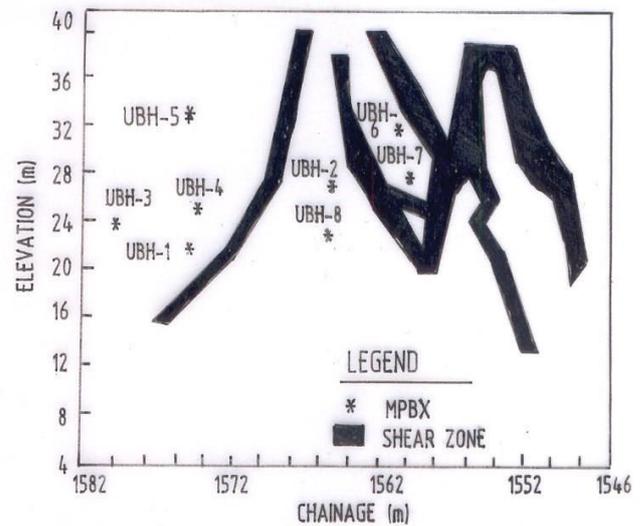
Instrumentation on upstream wall of powerhouse cavern along with shear
